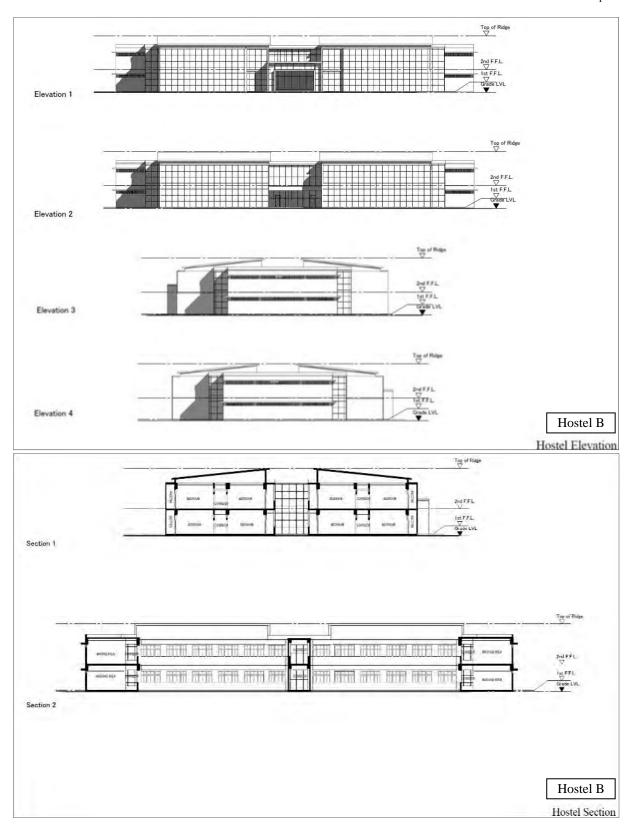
Plan of Hostel B (Elevation & Section)
